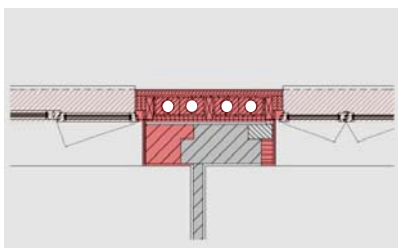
Horizontal section of façade element with integrated ventilation ducts
